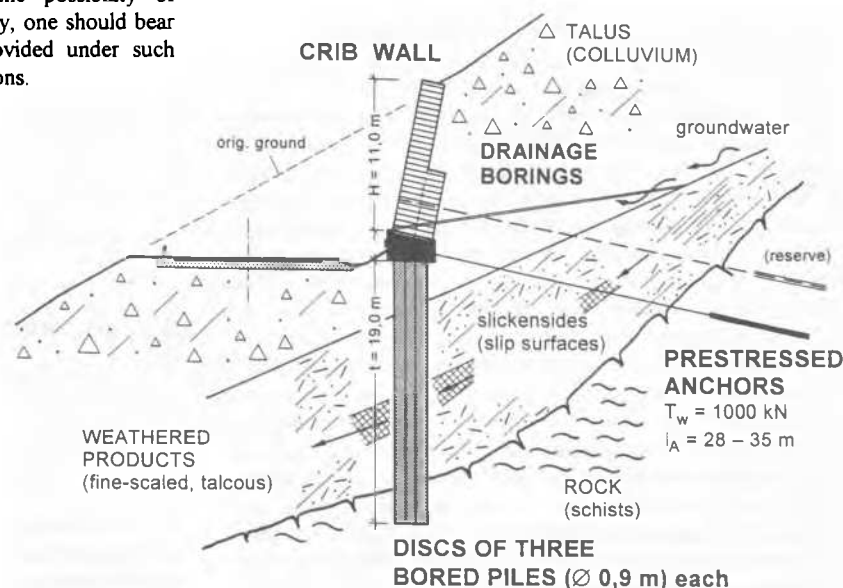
Combination of rigid and flexible retaining structures in a sliding slope: Pile wall (of disc-shaped elements), crib wall, and prestressed anchors.
